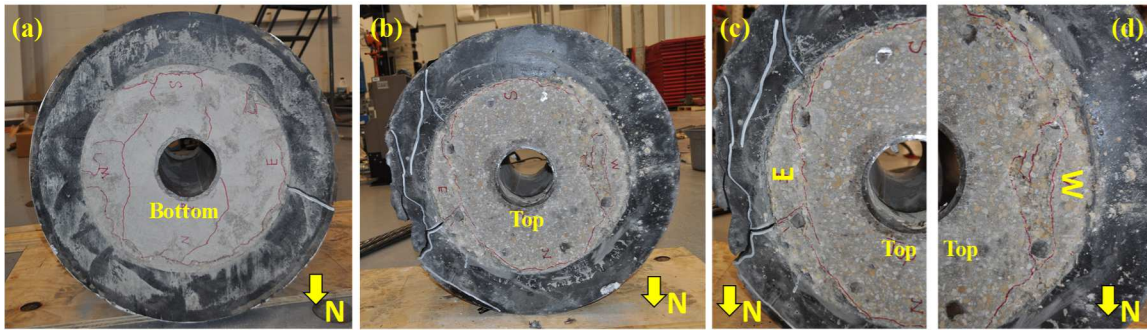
Visual inspection of the damage state at the top and bottom surfaces of the bi-layered PU segment.
